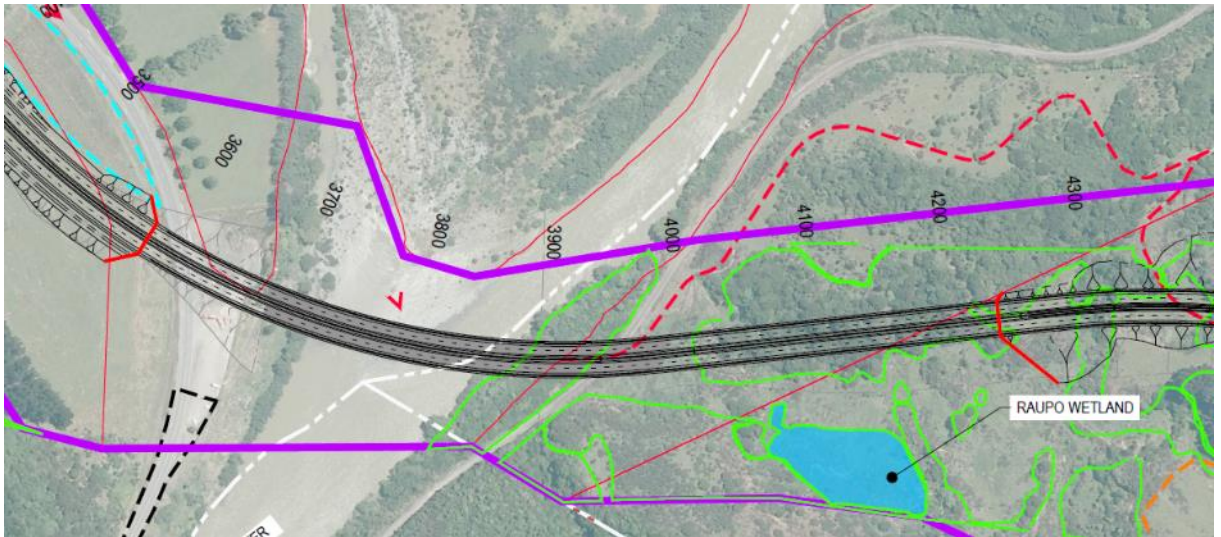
New Manawatū River Bridge – North Abutment to Beyond Forest and Wetland - Western Alignment
